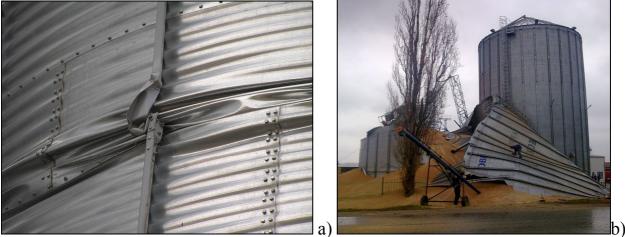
Damage of the joint block of vertical supporting stands (a), which led to the silo collapse (b)
